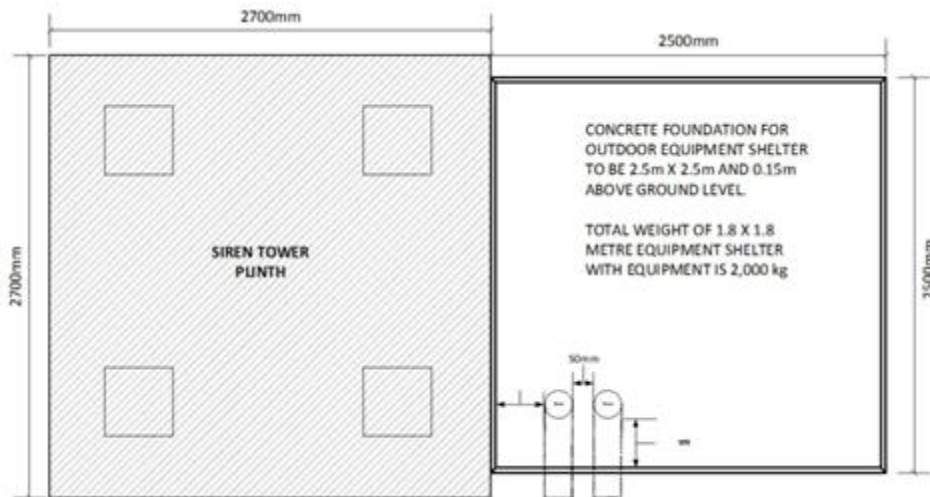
Plan View of the Typical Foundation Design for the Siren Tower Structures.
